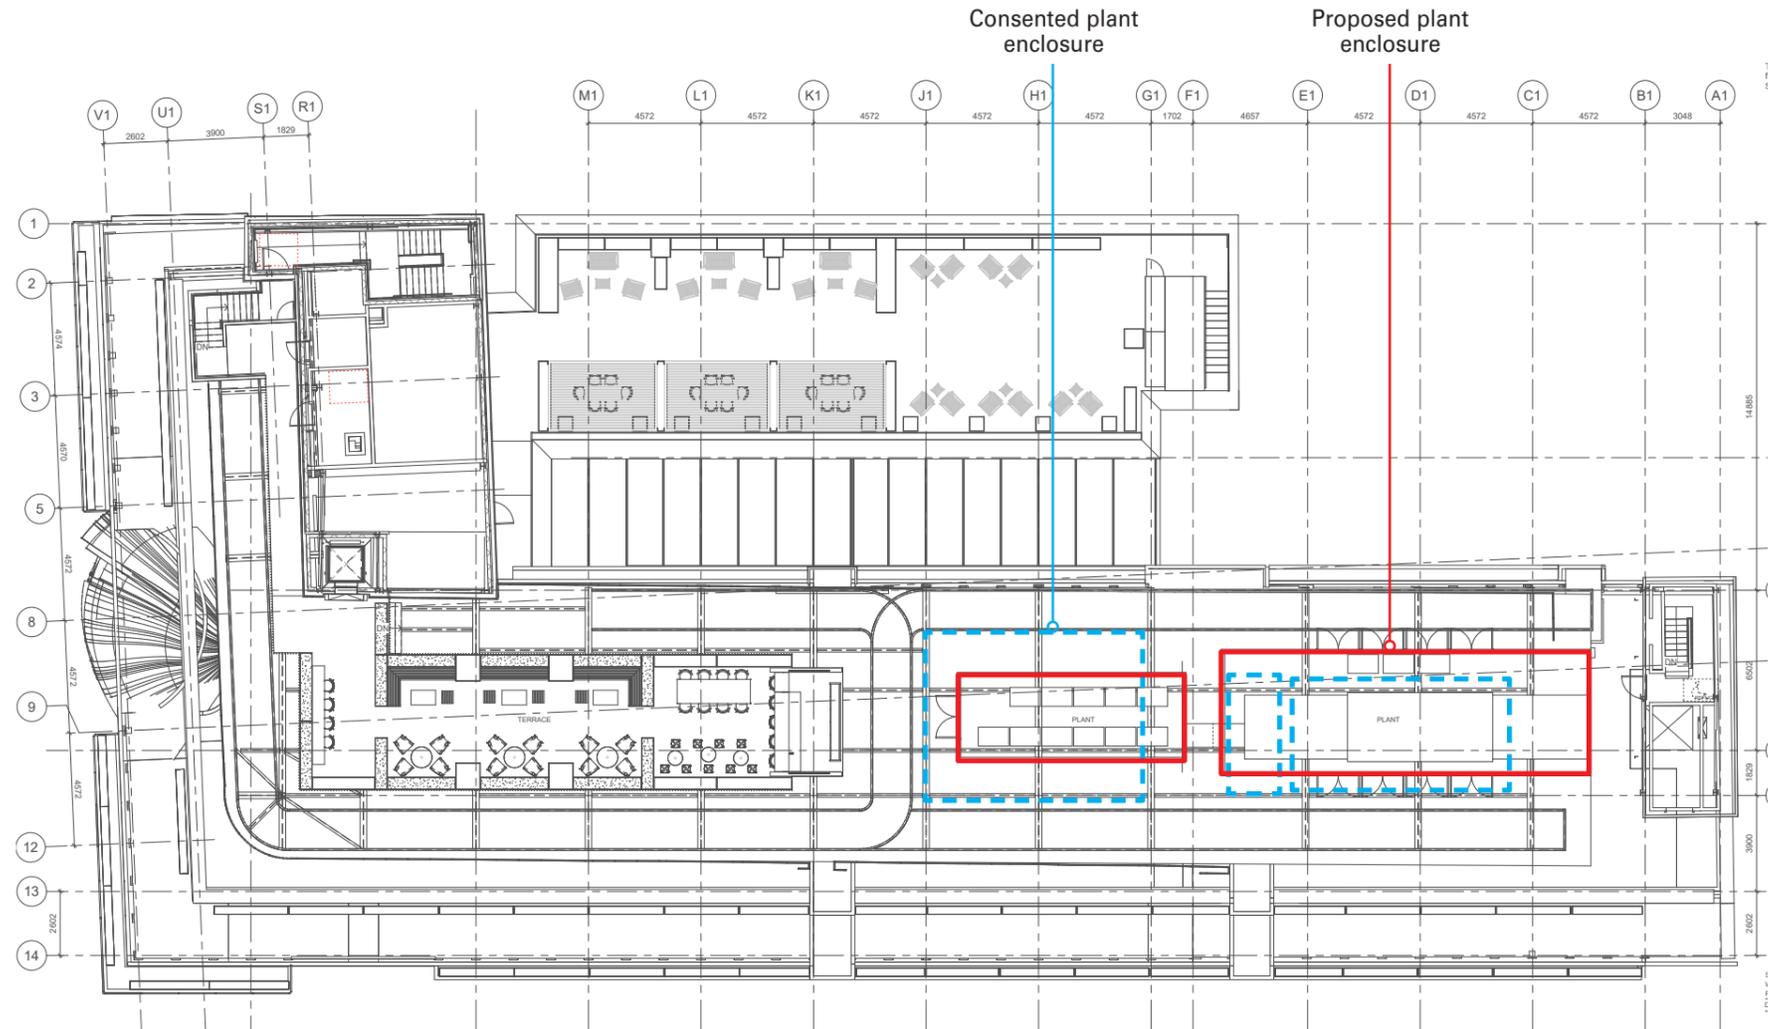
Roof plan - Overlay consented and proposed plant enclosure
